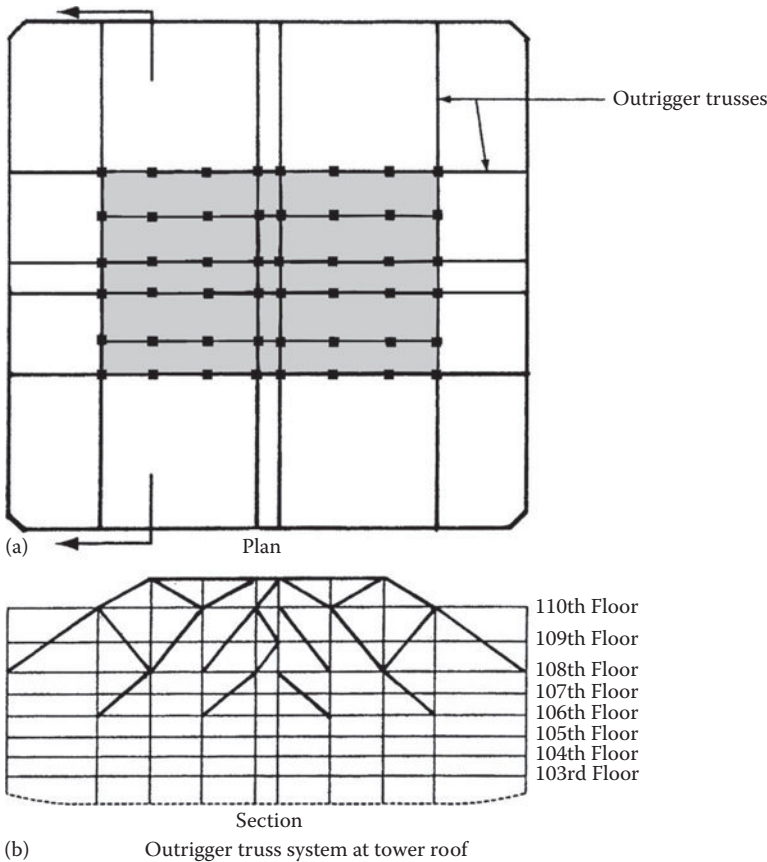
WTC outrigger system. (a) Top view; (b) side view at tower roof.
